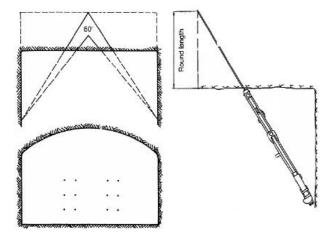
10. Feed set-up and drilling limitations in V cut.
